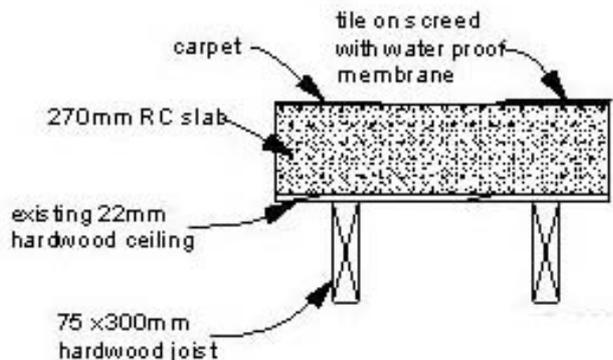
FLOOR / CEILING DETAIL SYSTEM 270mm
